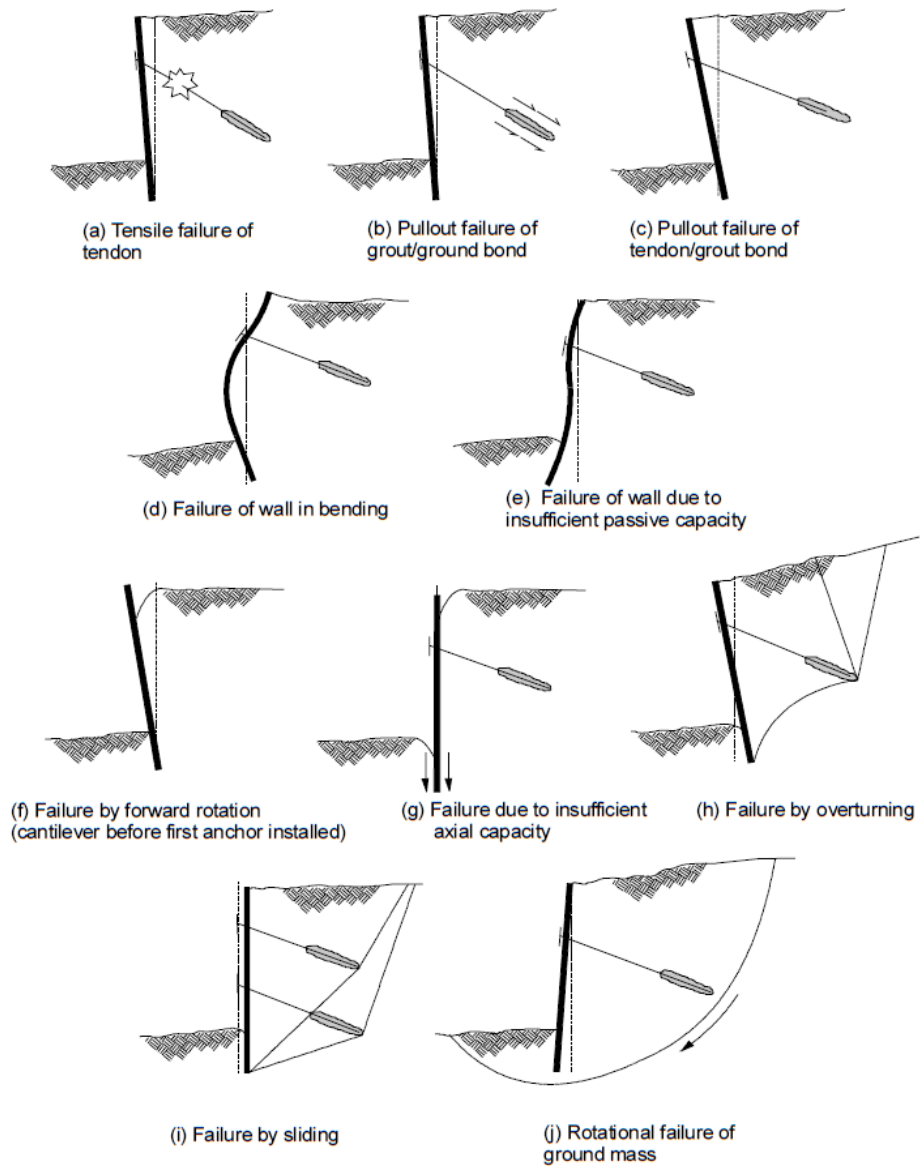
Failure Modes of Anchored Retaining Walls (Sabatini et al., 1999)
